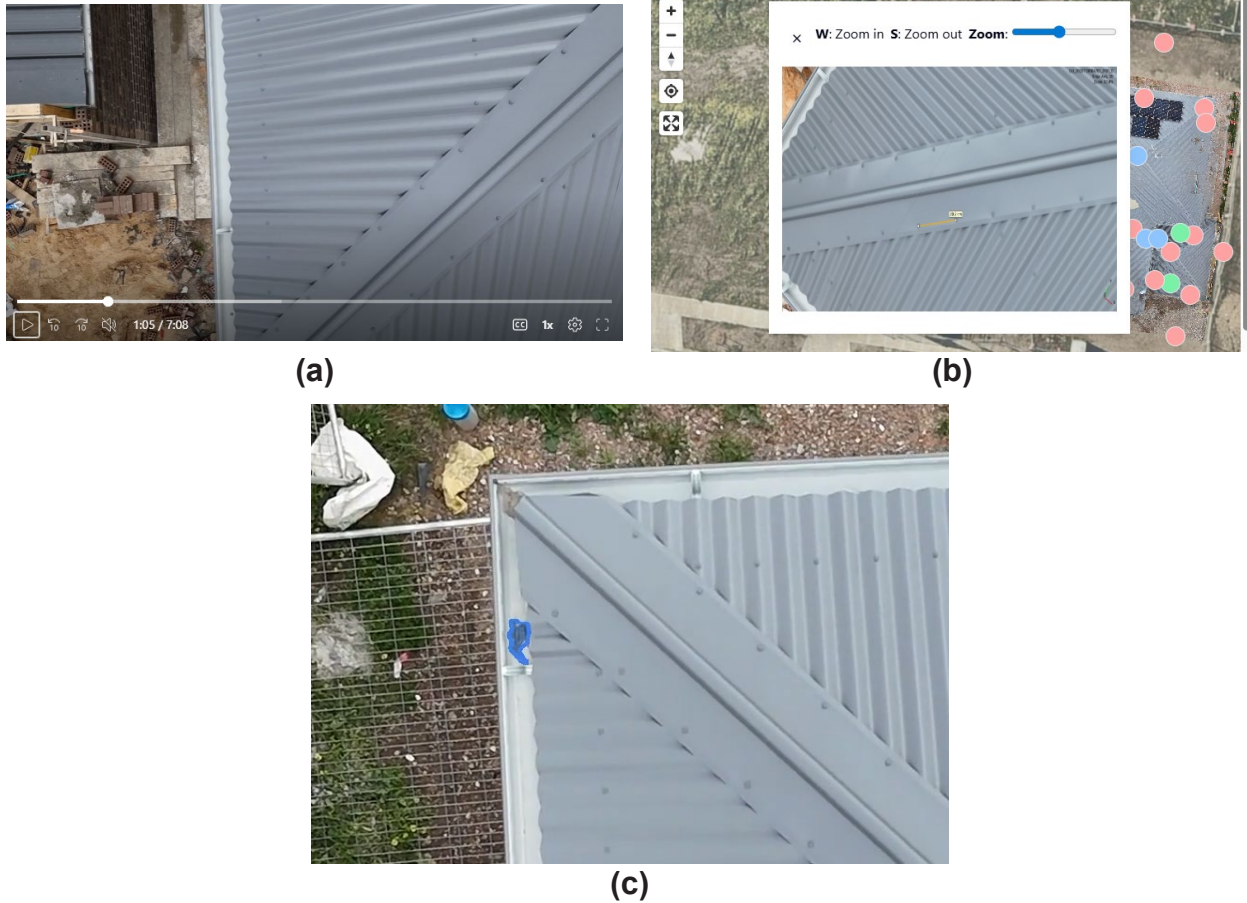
Examples of advanced imaging inspection tools (a) Tool A: video inspection, (b) Tool B: web-based image inspection, (c) Tool C: AI-assisted anomaly detection
